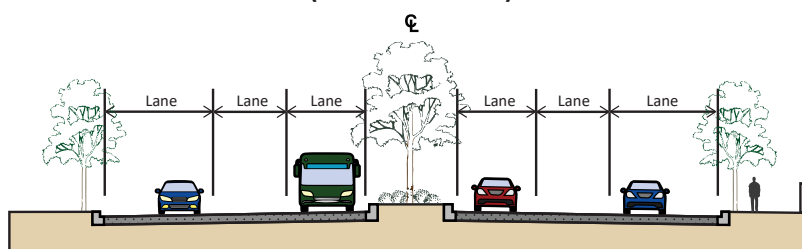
NEWPORT BEACH GENERAL PLAN ROADWAY CROSS-SECTIONS
